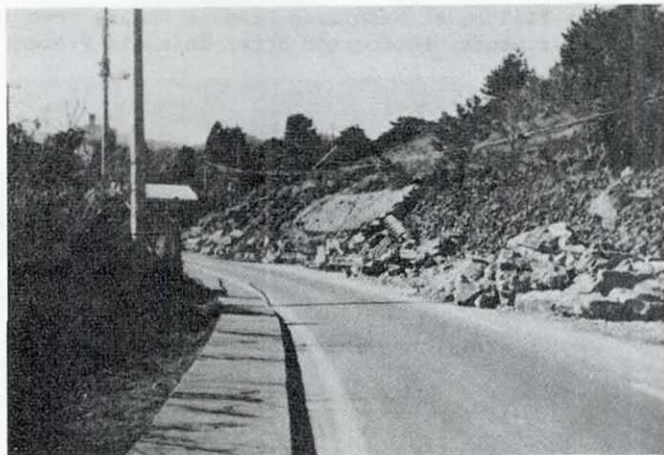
FAILURE OF MASONRY WALL AT INATORI AREA IN
